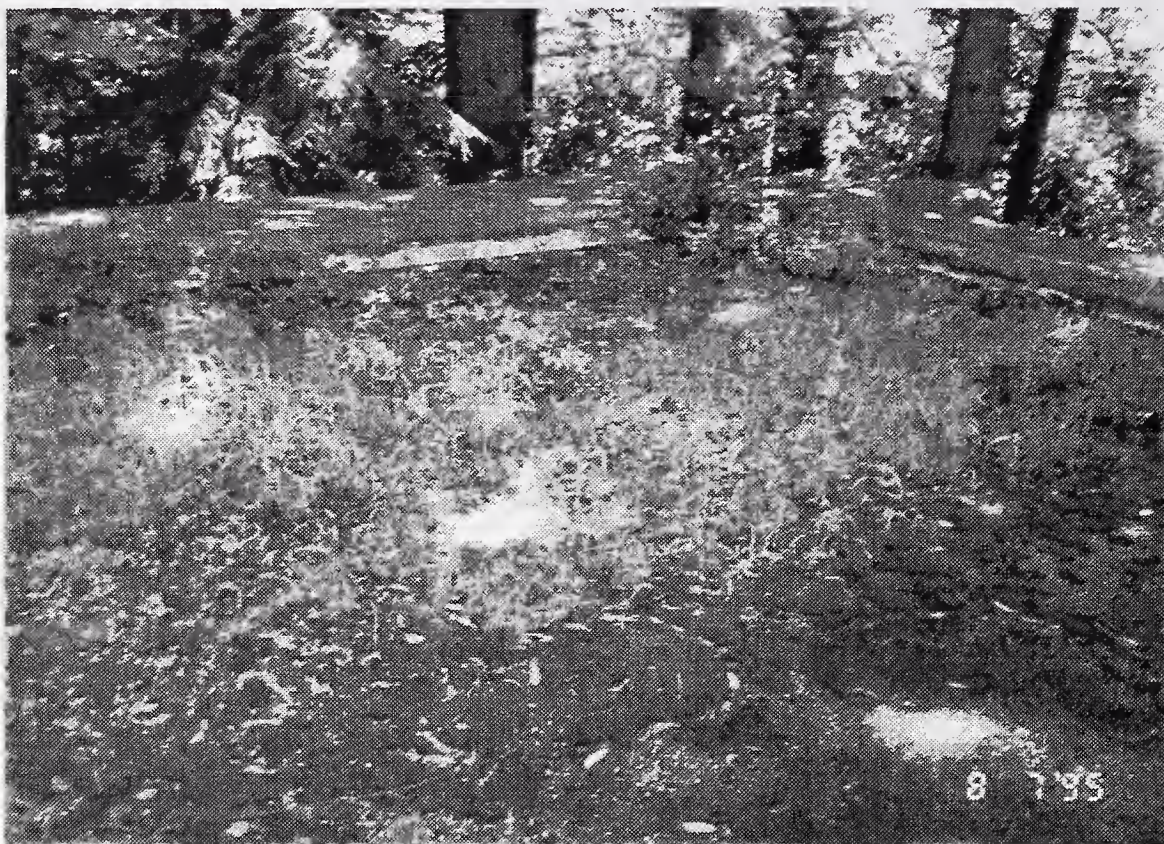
Overgrown and Heavily Damaged Tar-and-Gravel Covered Ballroom Patio.
